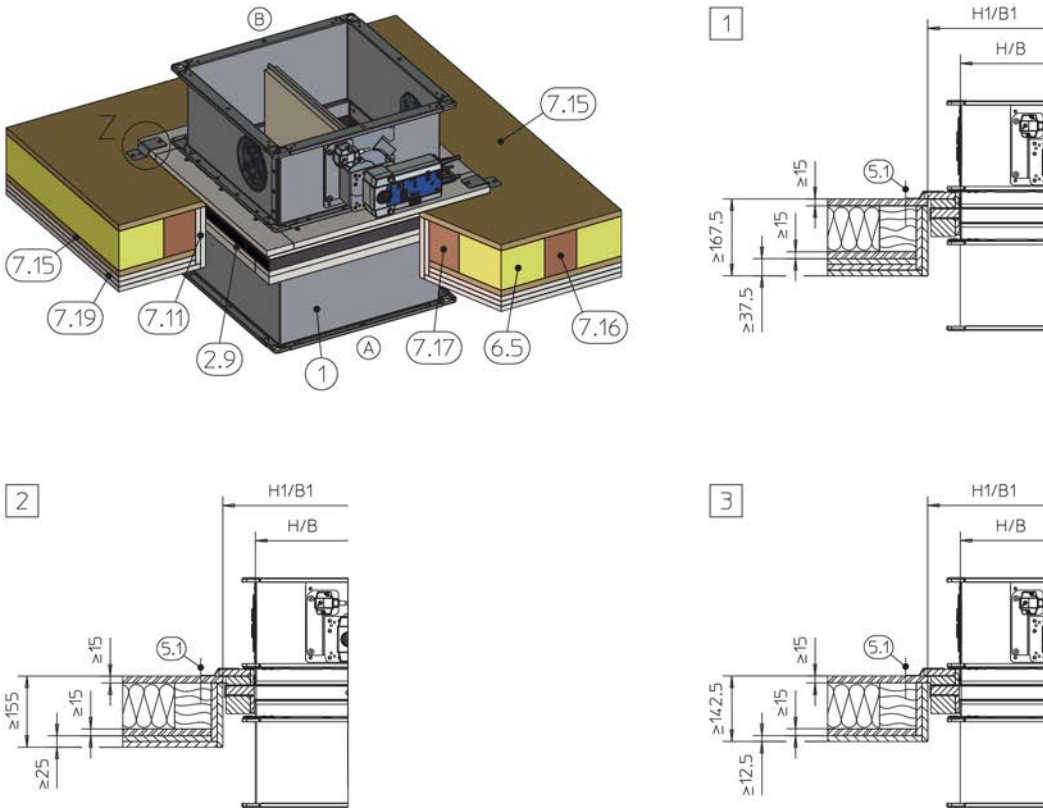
Mortar-based installation into wooden beam / laminated beam ceiling, suspended (illustration representative, alternative ceiling construction possible on request)
